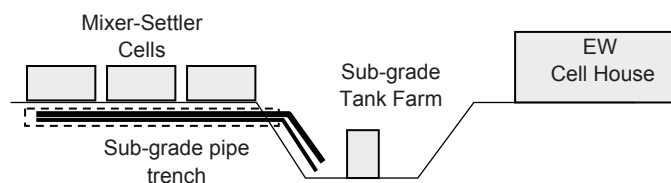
Cross sectional view of "typical" SX plant layout (drawing by author)
